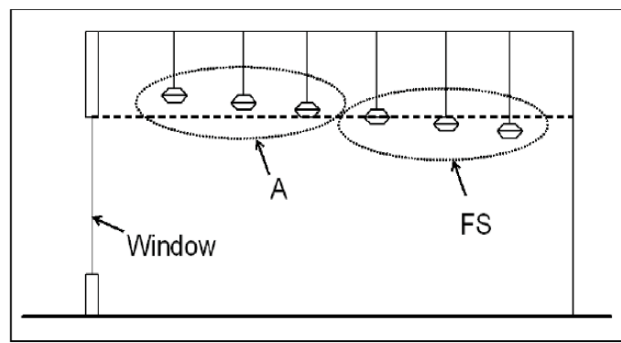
Figure A: Elevation view showing a non-residential application of indoor lighting, labeled FS, which will be subject to this article and indoor lighting, labeled A, which is installed so that it is not subject to this article.
